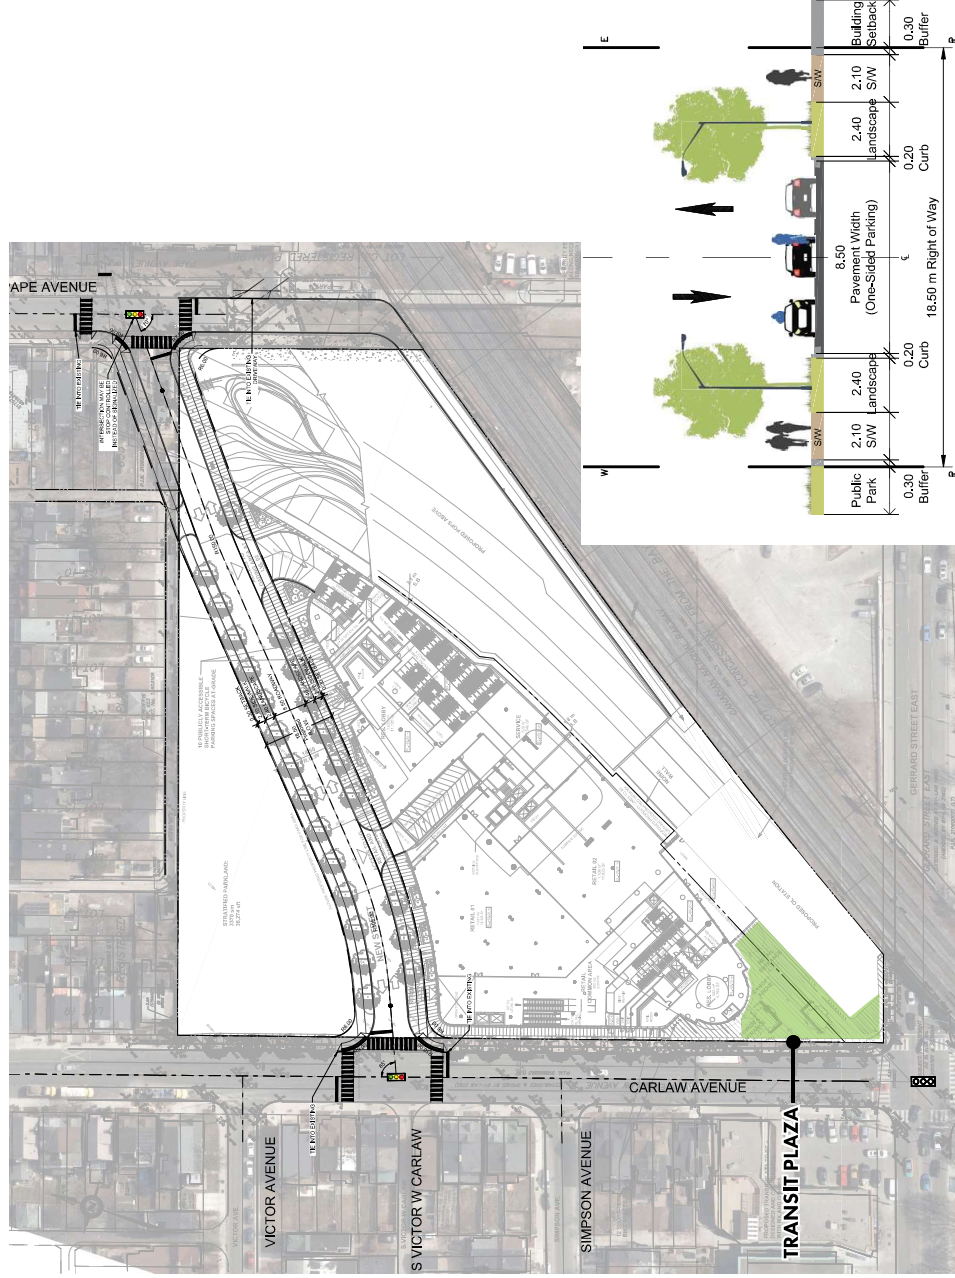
The proposed new 18.5 metre wide Public Street, Functional Plan prepared by BA Group
